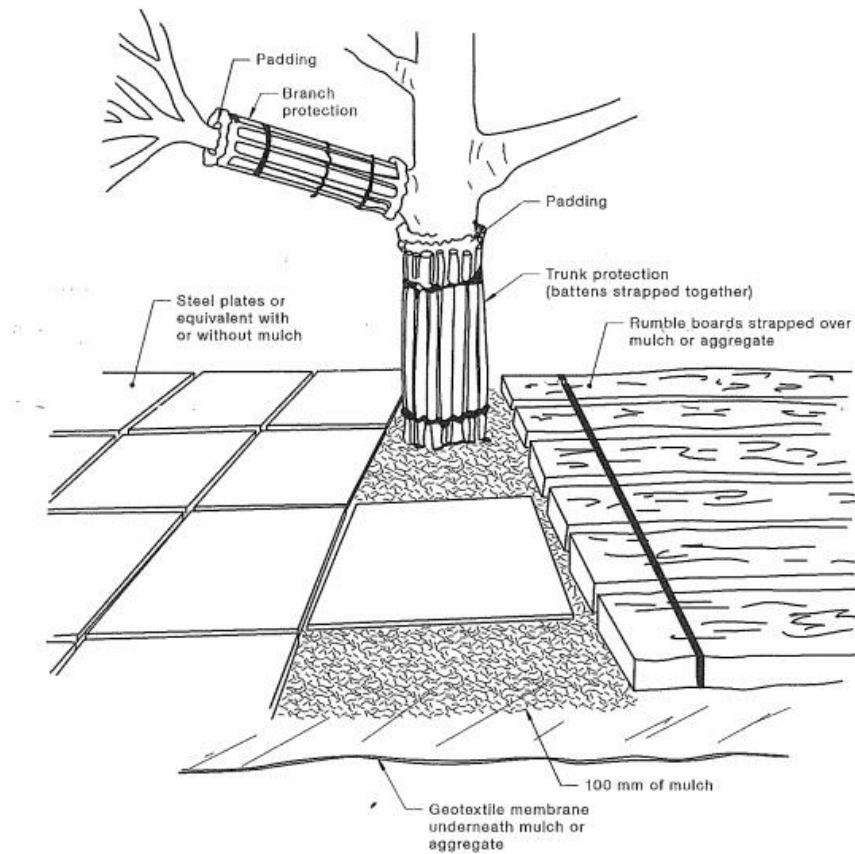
Trunk and branch protection shall be installed as shown in the attached diagram. The materials and positioning of protection are to be specified by the project arborist. A minimum height of 2m is recommended. No temporary power lines, stays, guys and the like are to be attached to any part of the tree. Do not drive nails into the trunks or branches. If temporary access for machinery is required within the TPZ ground protection measures will be required. Measures may include a permeable membrane such as geotextile fabric beneath a layer of mulch or crushed rock below rumble boards.
